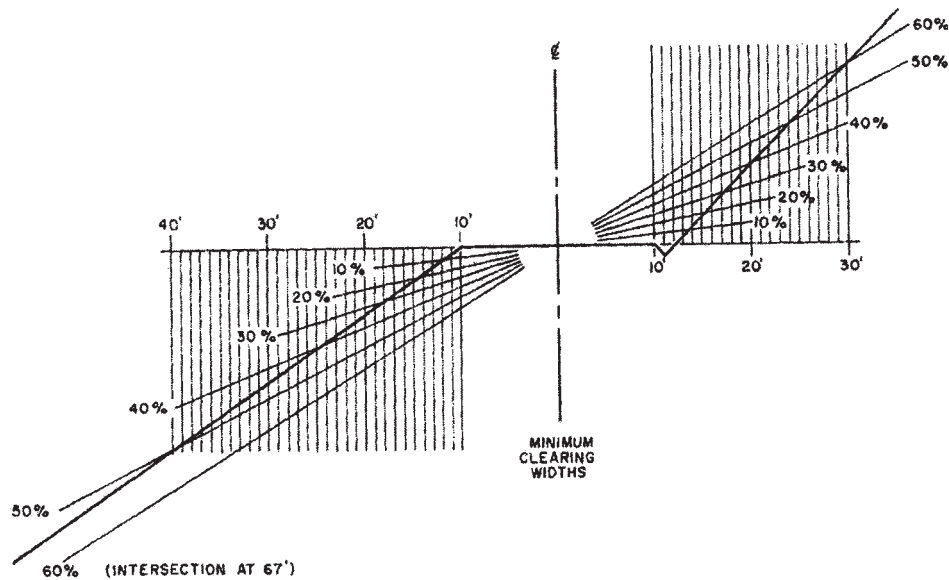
Cut and fill cross-section of haul road on moderate slope showing uphill and downhill minimum clearing limits for alternative side slopes (from Wenger 1984).
